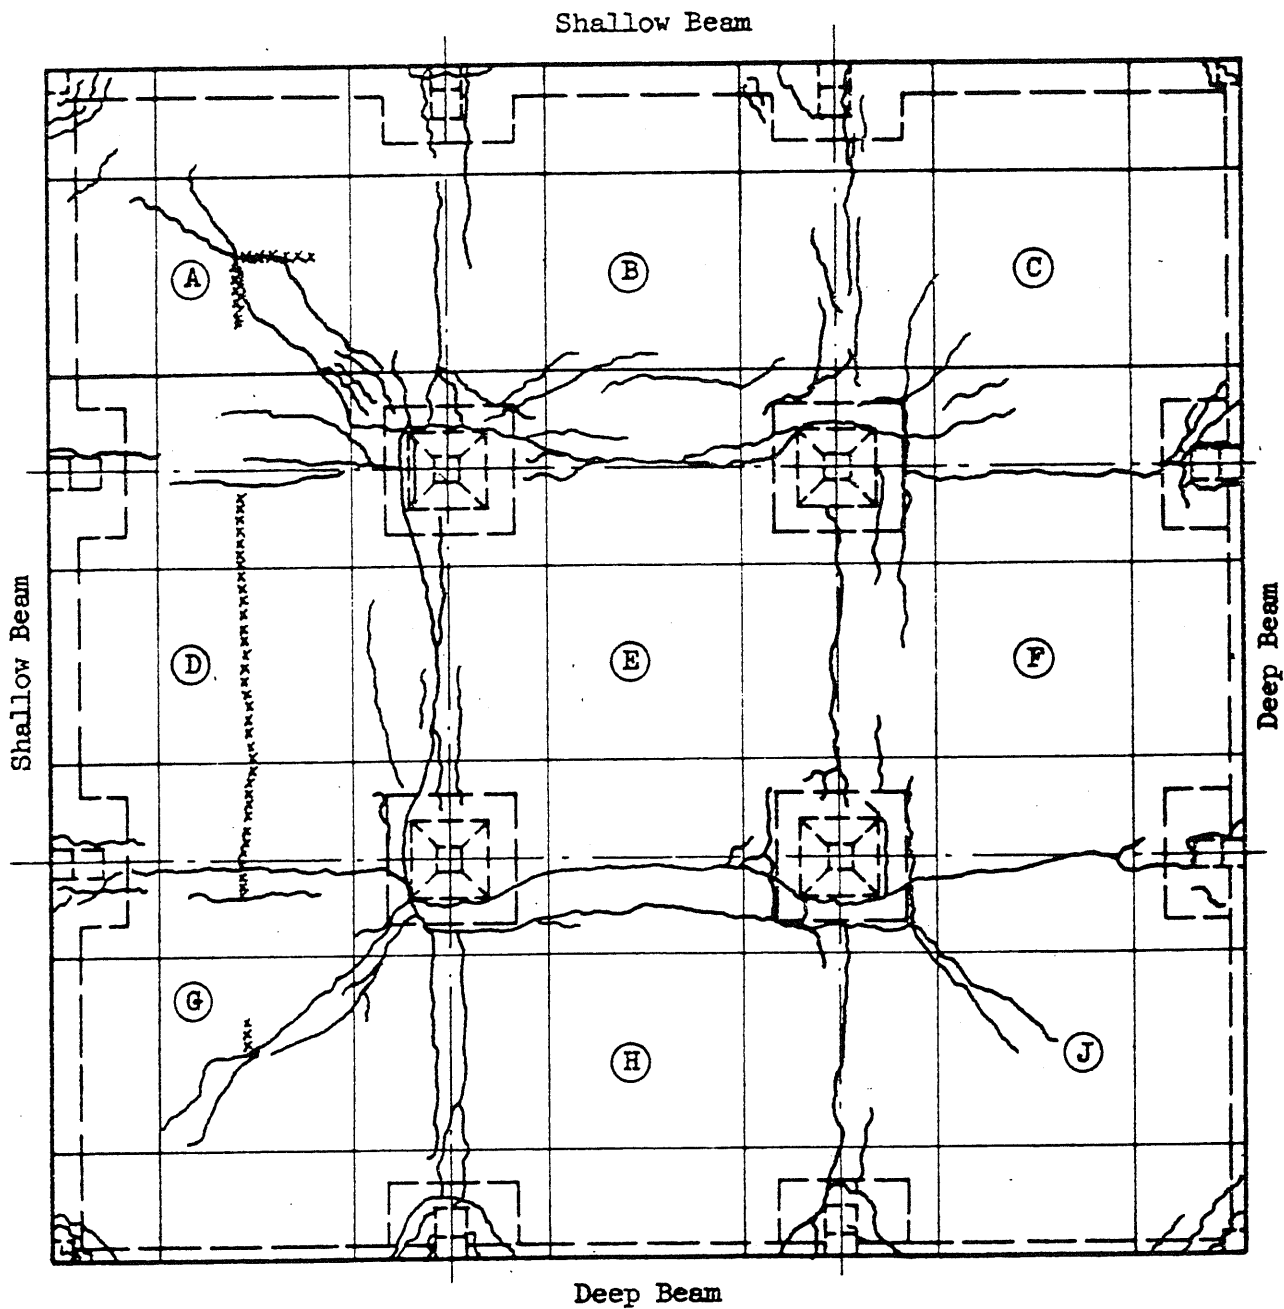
CRACK PATTERN ON TOP OF SLAB F4 AFTER TEST TO FAILURE
